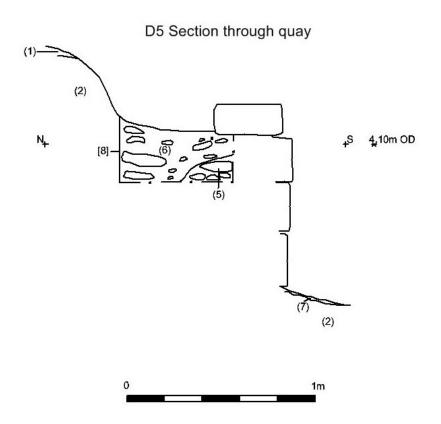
Section drawing through the Upper Quay wall in test-pit 1
